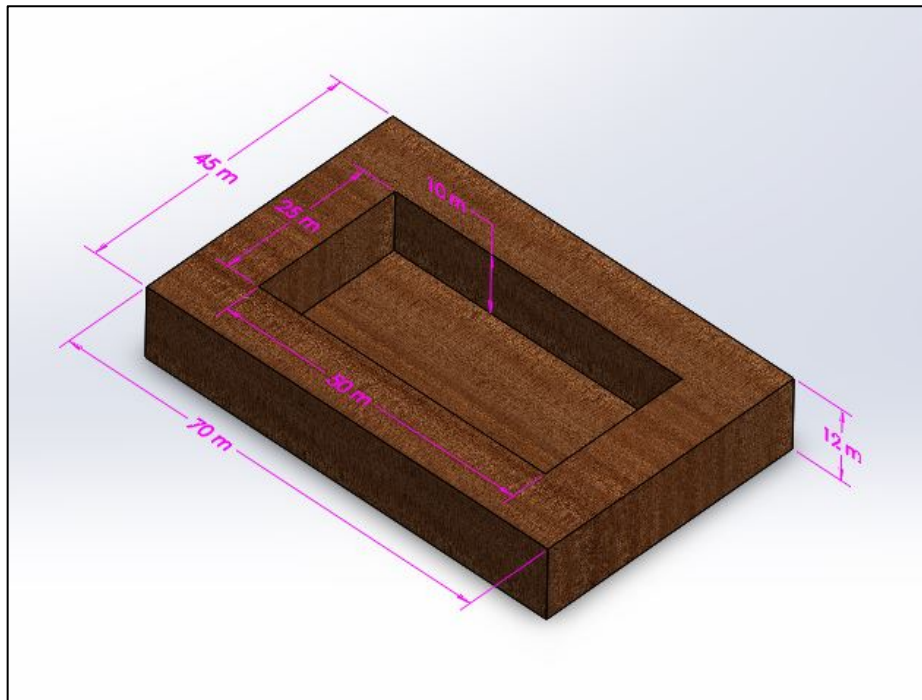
Dimensioned Solidworks soil component used in the assembly for the transient thermal study.
